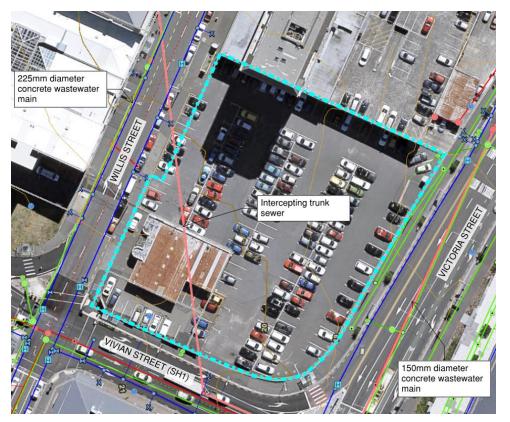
Wastewater Drainage Overview (Source: WCC GIS)
